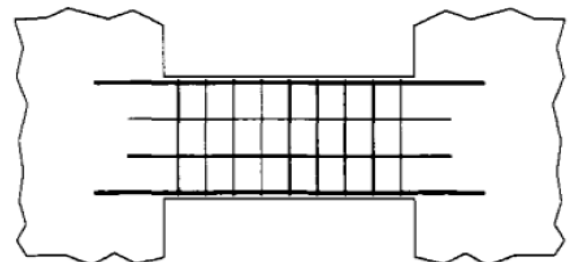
Typical Layout of Conventionally Reinforced Concrete Coupling Beam
